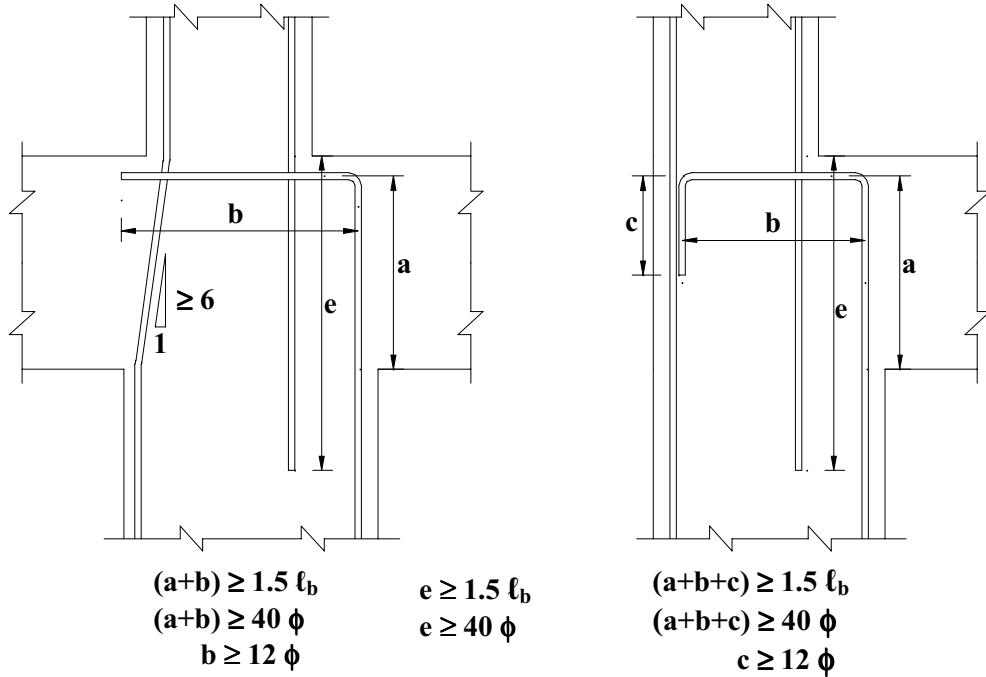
Longitudinal reinforcement in beam-column joints (TEC-2007)
